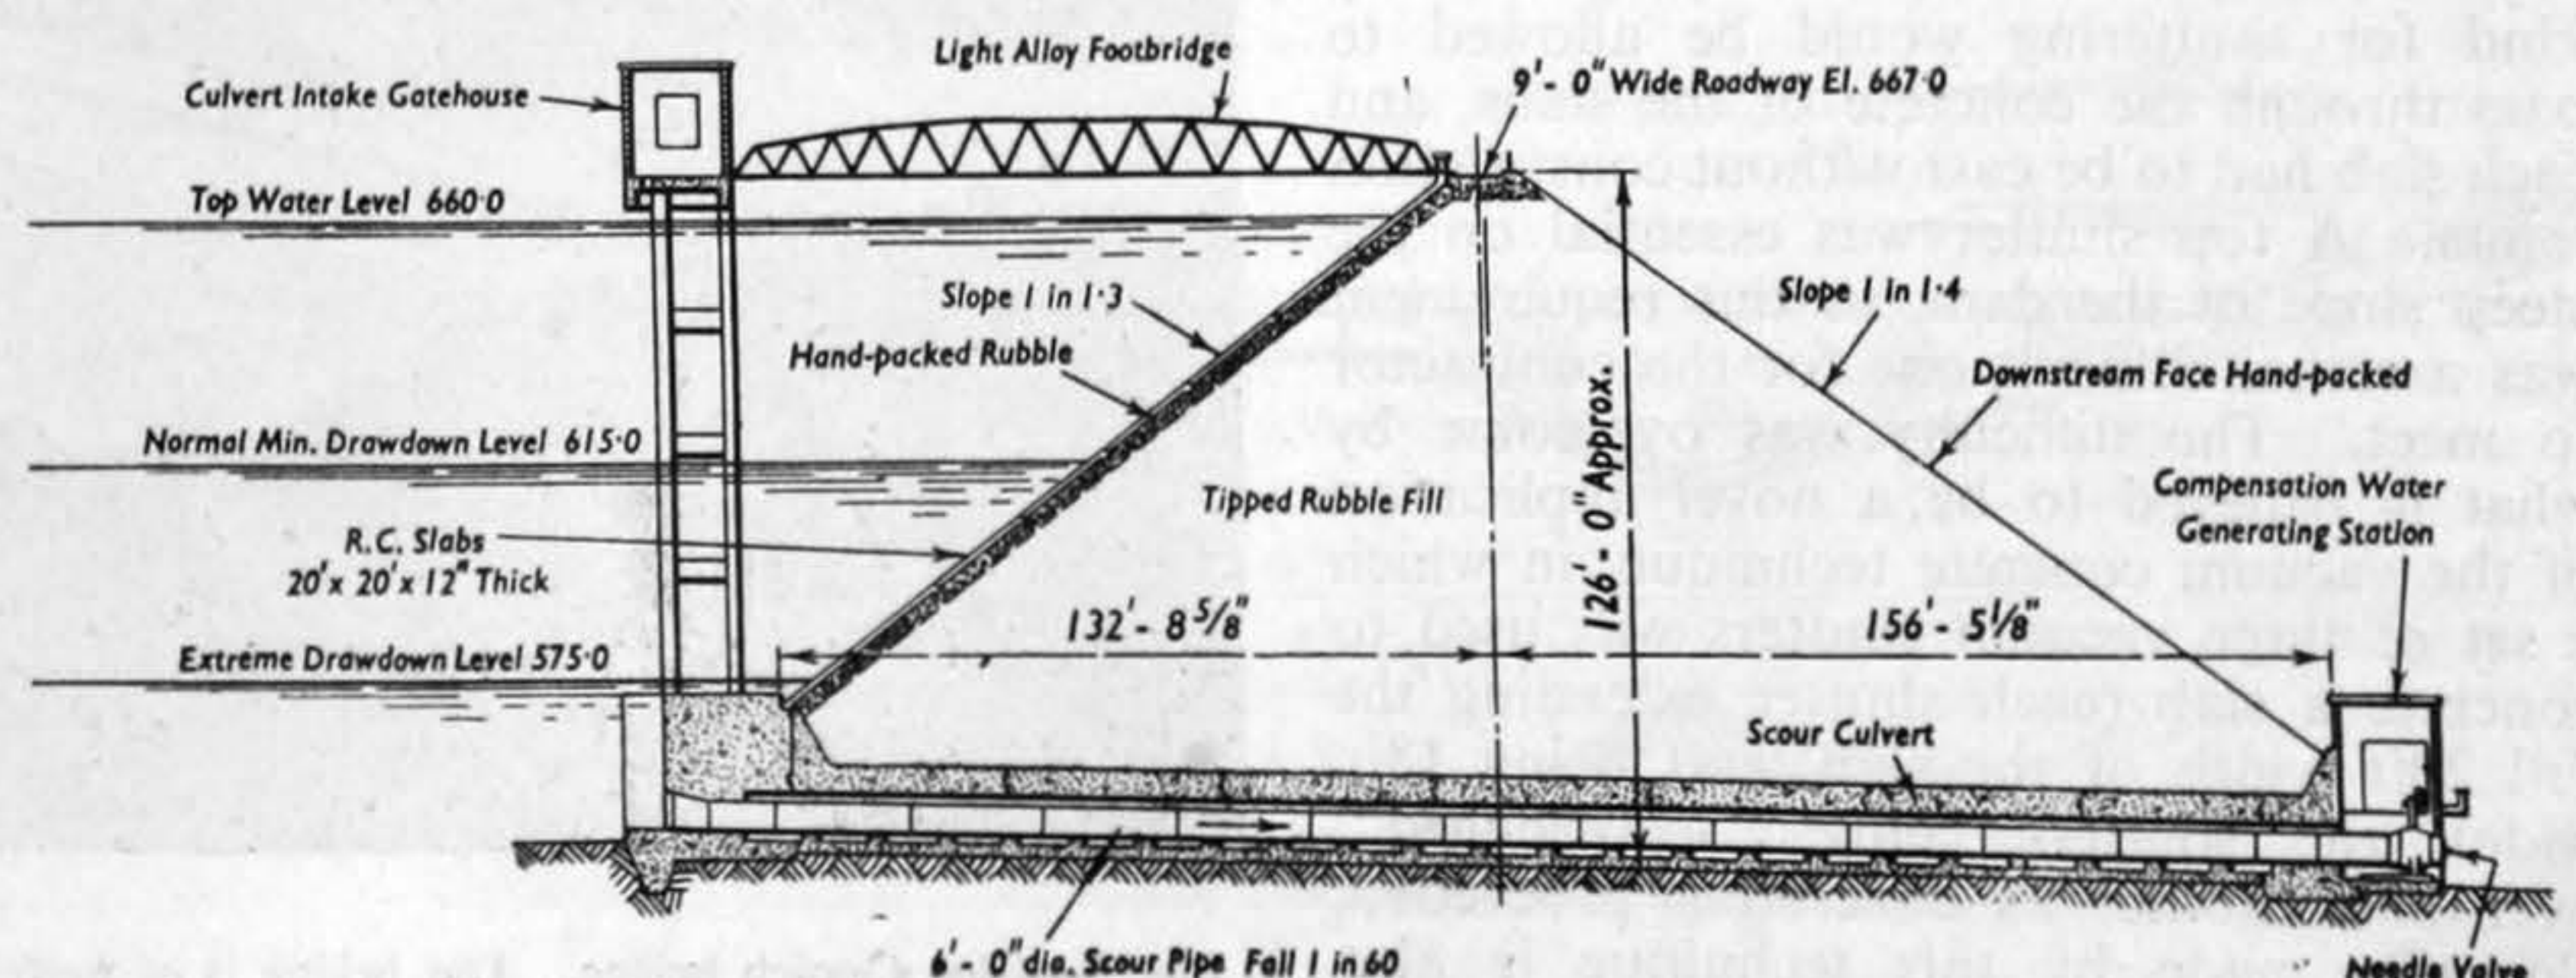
Cross section of Quoich dam on centre line of scour culvert
